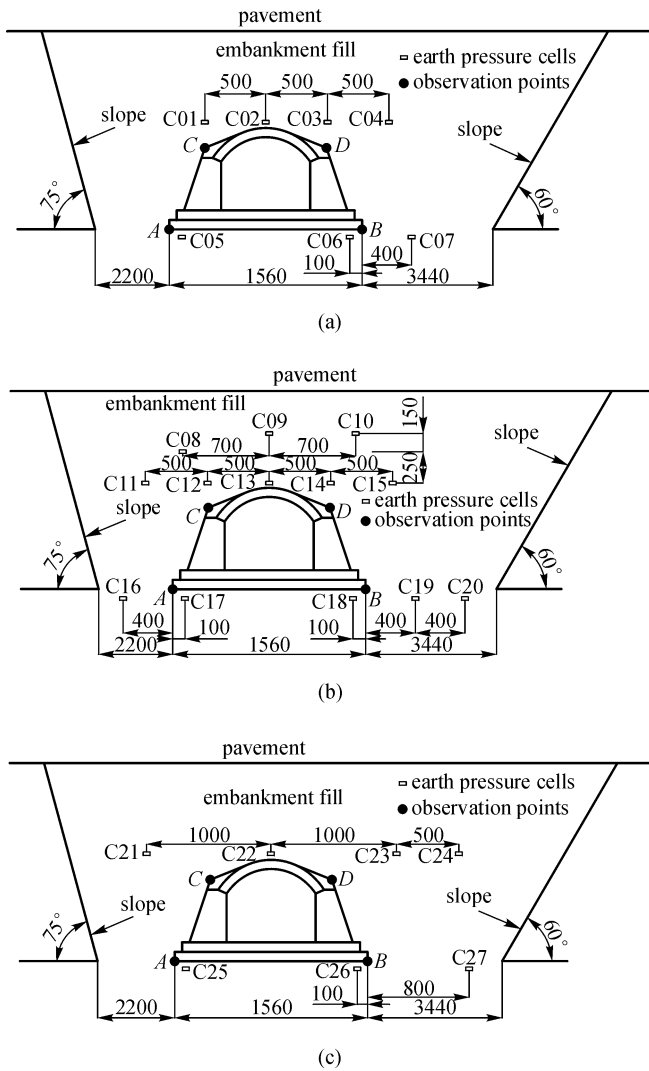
Layout of cells and settlement points in field. (a) Section No. 4; (b) section No. 6; (c) section No. 7 (unit: cm)
